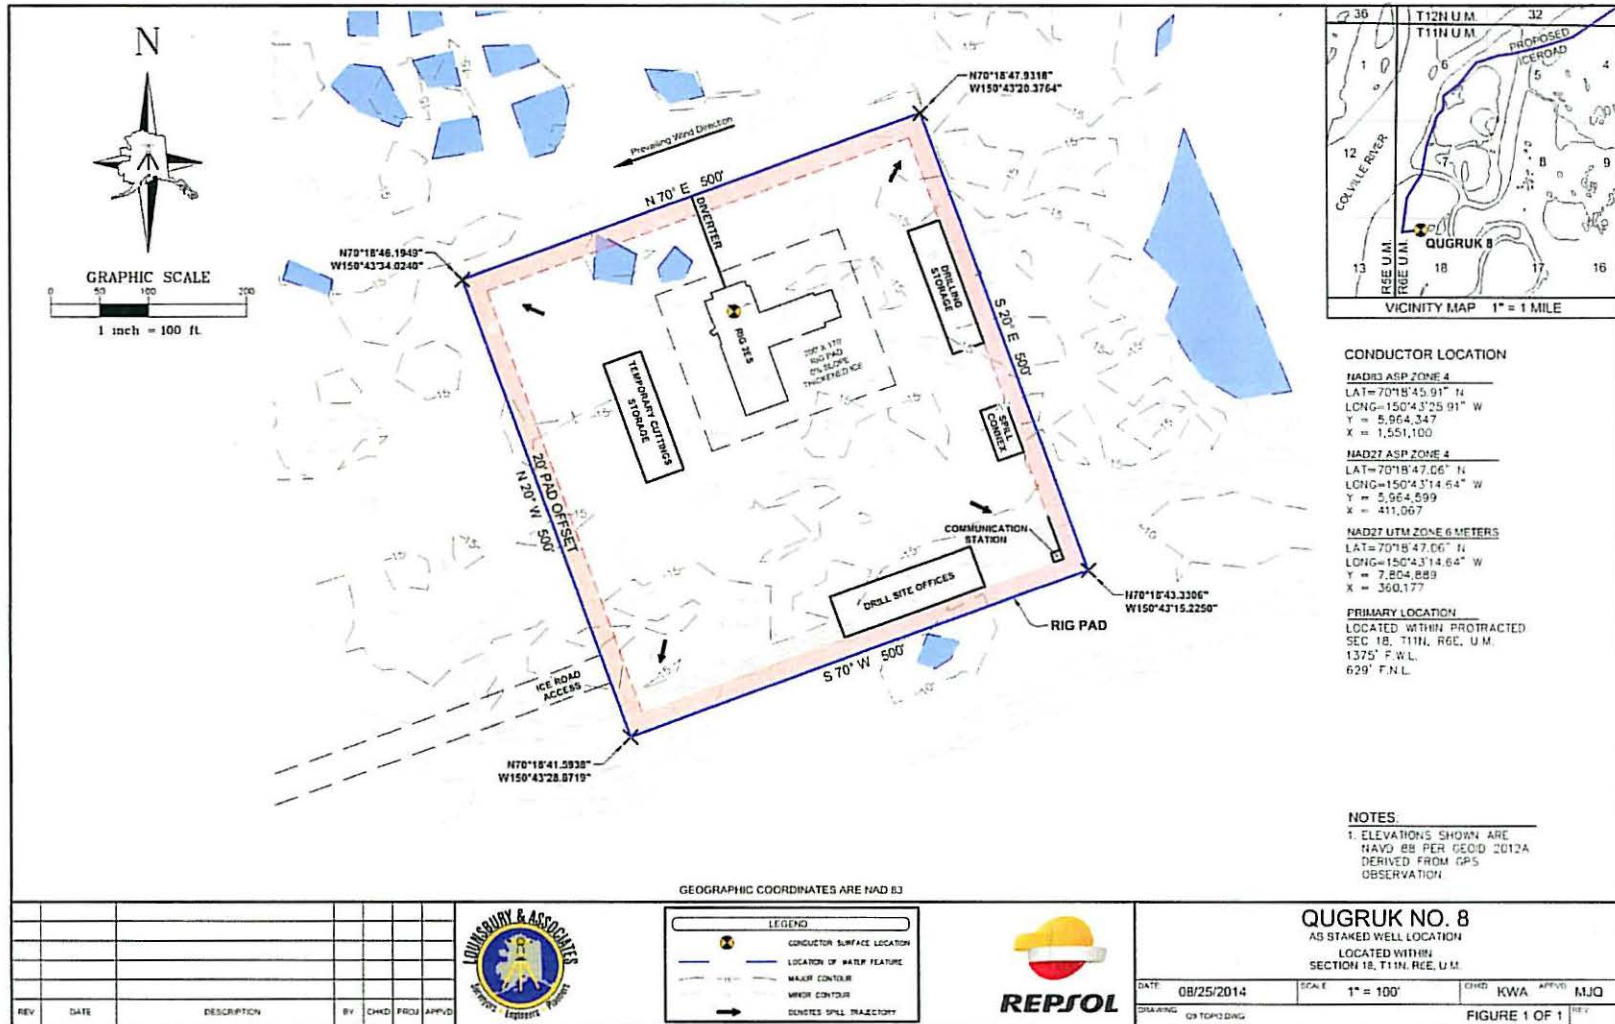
Qugruk No. 801 Drill Site Pad Layout
